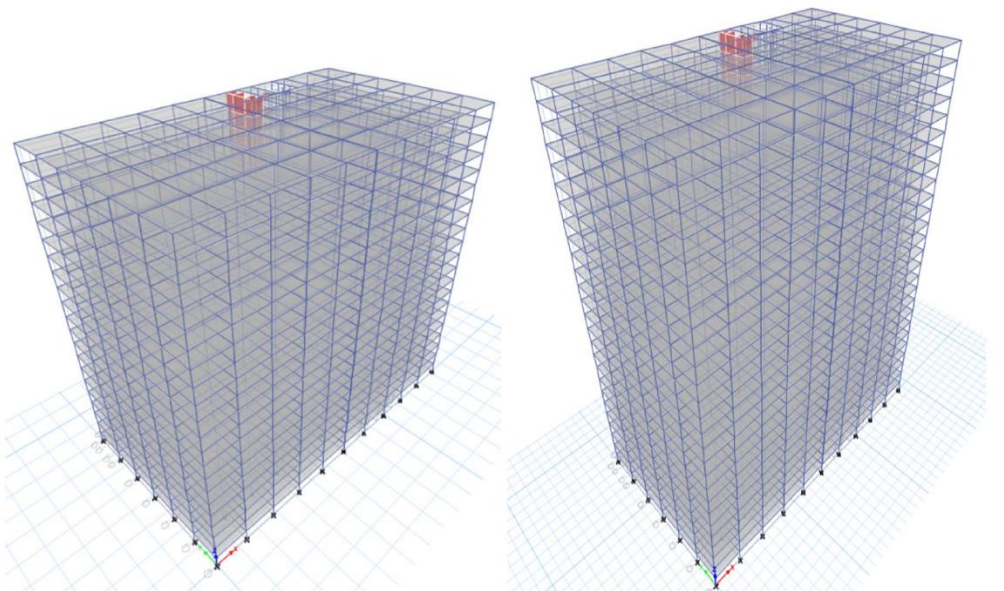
ETABS 3D model with expansion joint: (a) 20-storey building; (b) 25-storey building.
